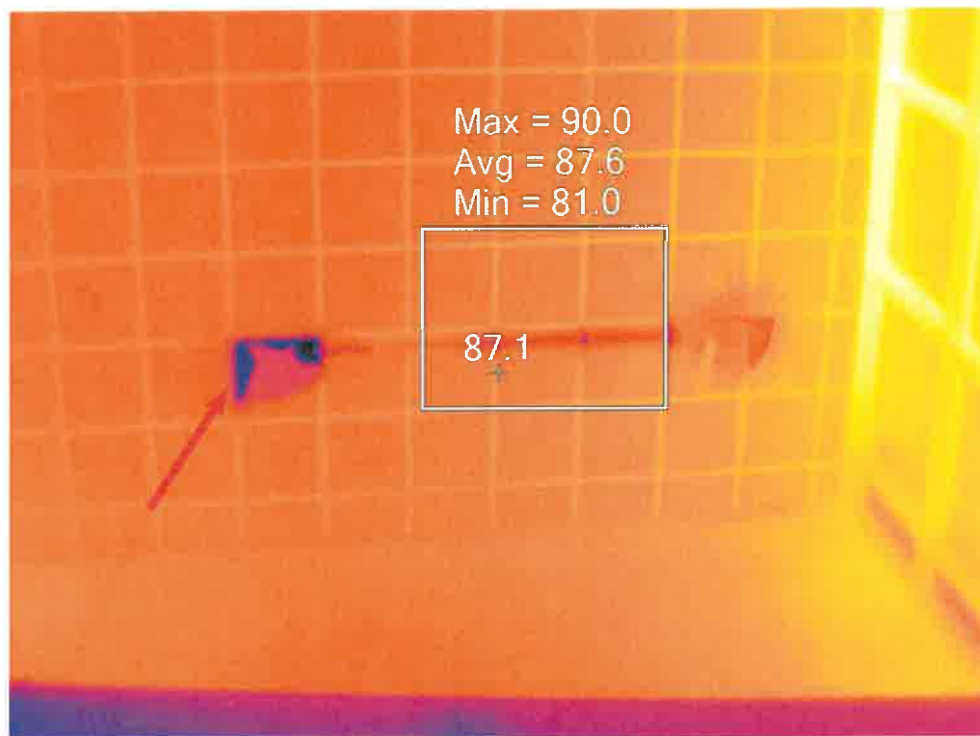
Water leakage observed while testing the masonry metal flashing.
